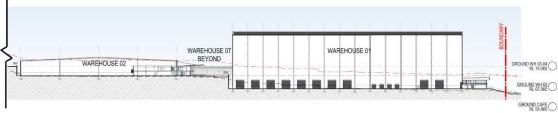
Elevation detail of the proposed warehouses (Source: SBA)
